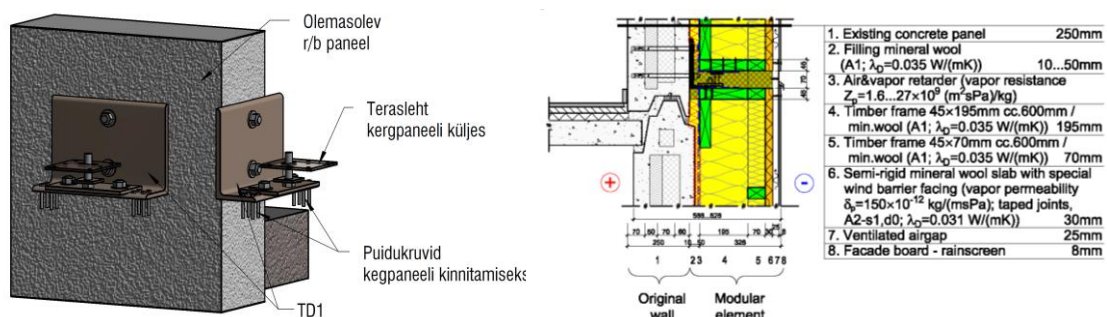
Newly developed 3D connection (left) and wall panel cross-section (right).
